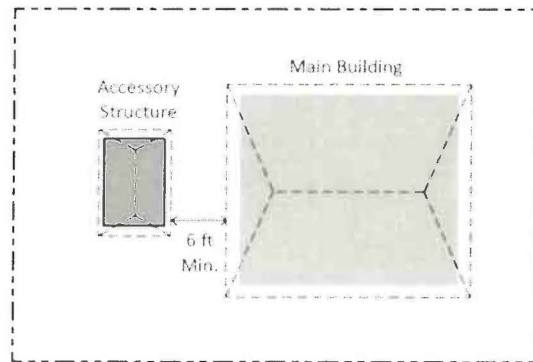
F: ACCESSORY STRUCTURE SEPARATION FROM MAIN BUILDING
